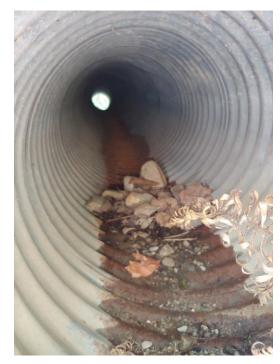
Ditch 2 Culvert, West View from Outlet
